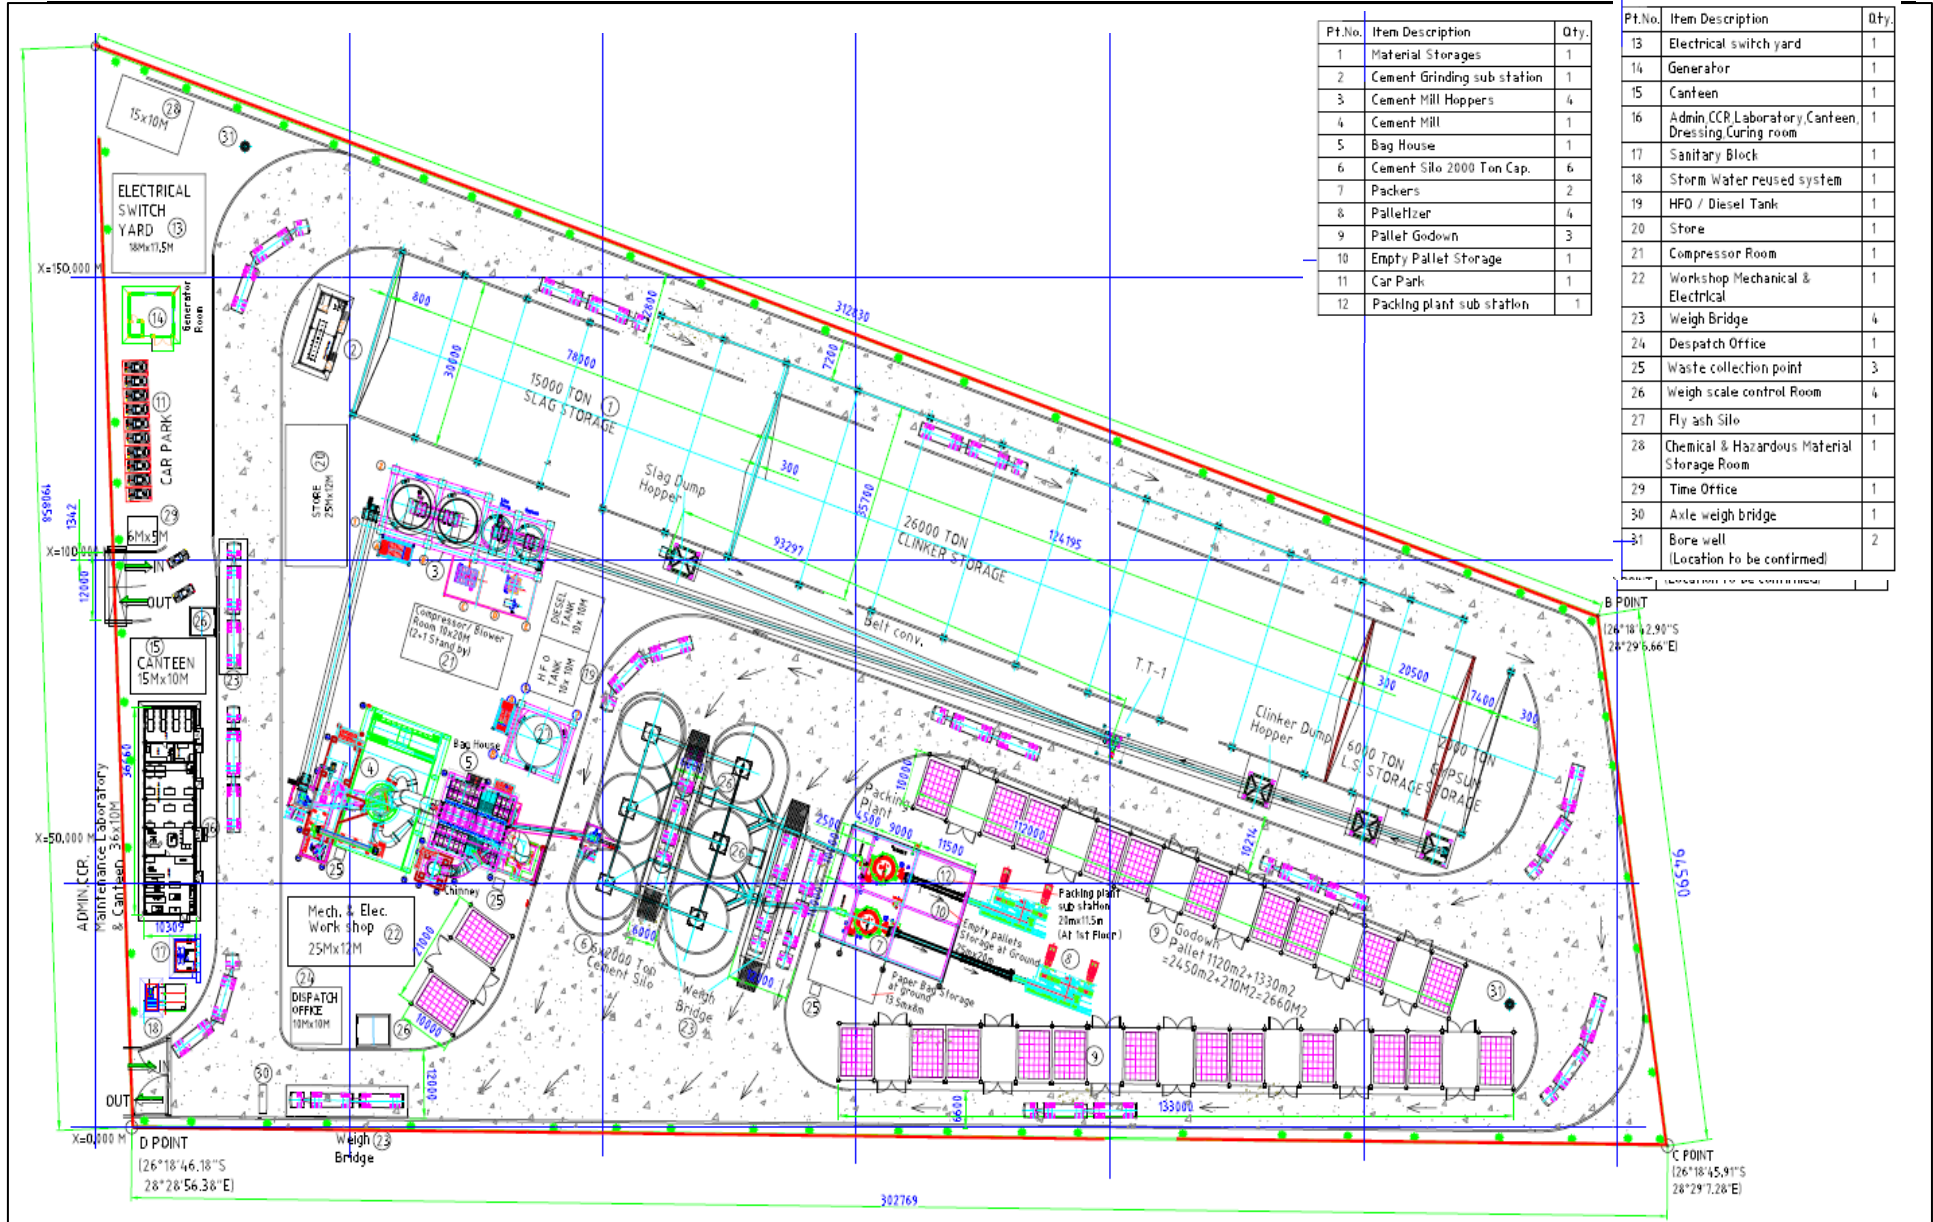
Preliminary Layout of the proposed new Springs cement grinding facility (Source: Cemza, 2022).
